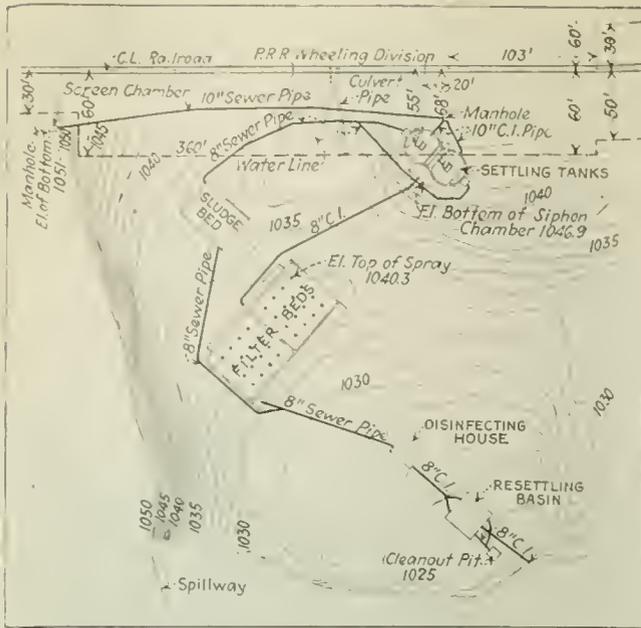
PLAN SHOWING ARRANGEMENT OF UNITS
